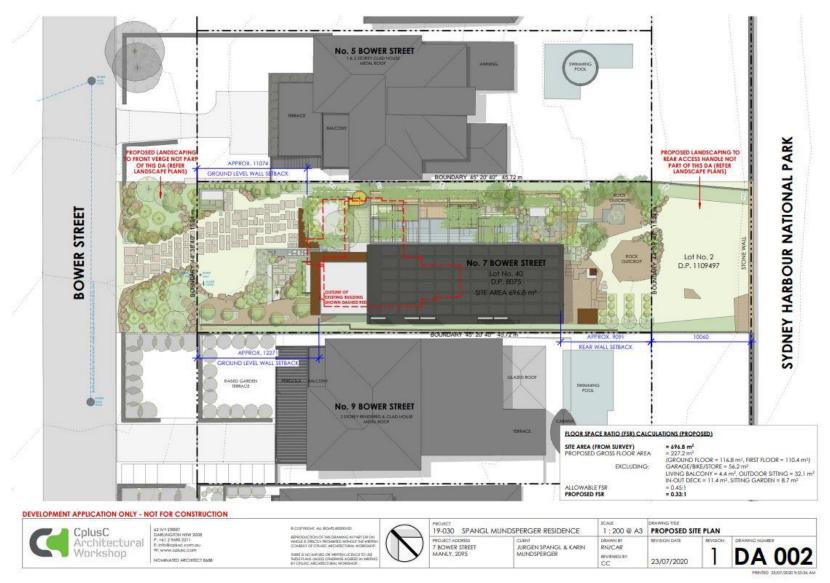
Site plan of proposed new dwelling house at 7 Bower Street, Manly (see final architectural plans from CplusC Architectural Workshop Revision 1 (2020))
